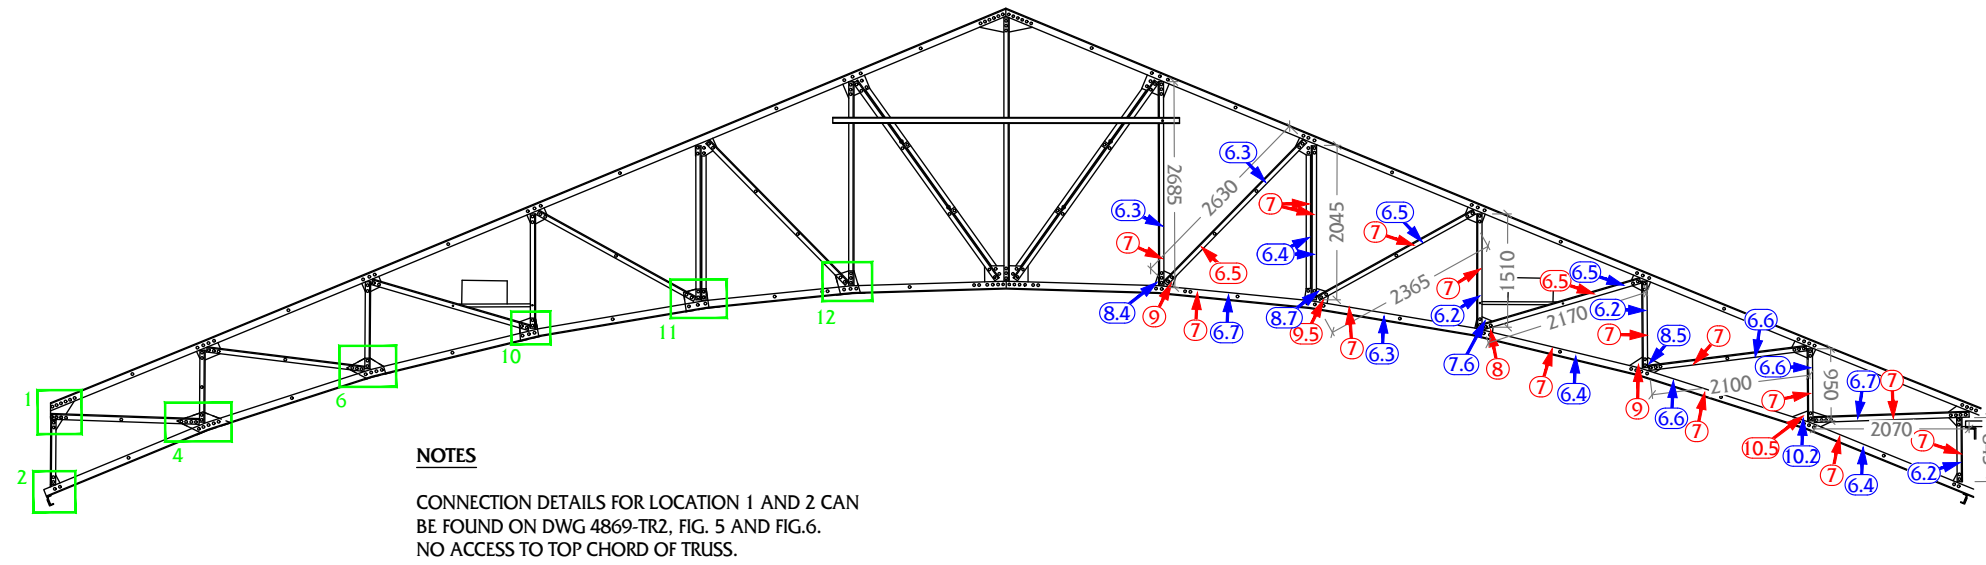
ELEVATION LOOKING SOUTH SHOWING LOCATIONS OF TRUSS CONNECTIONS SURVEYED AND ARRANGEMENT OF TRUSS H NOT TO SCALE
